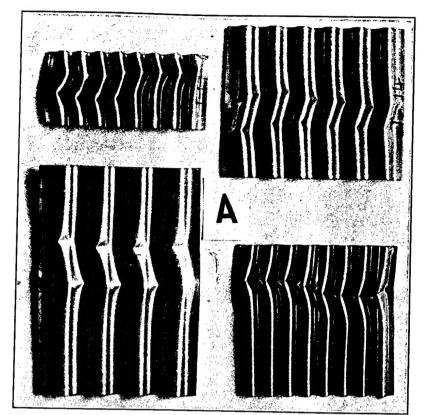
Buckling Failure of Corrugated Sheet.
